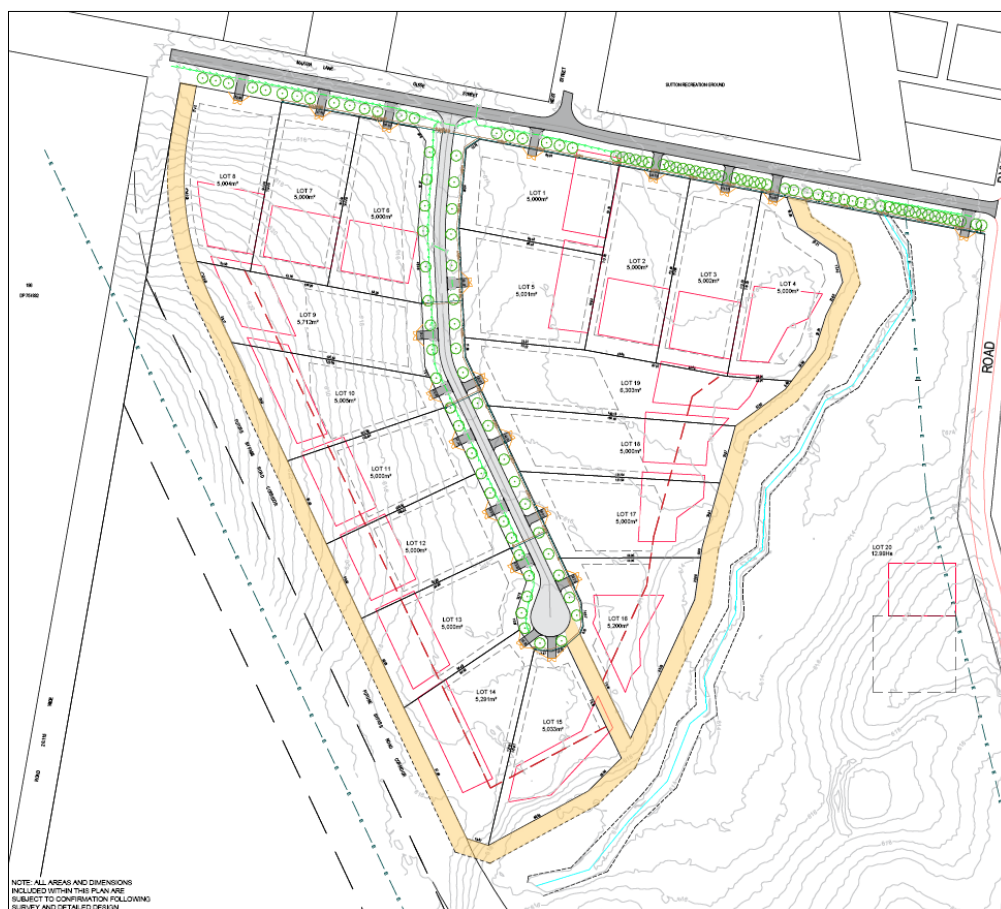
S4.55 Proposed Modified Plans (Detail on R2 Residential Lots & Adjacent Parcel)
